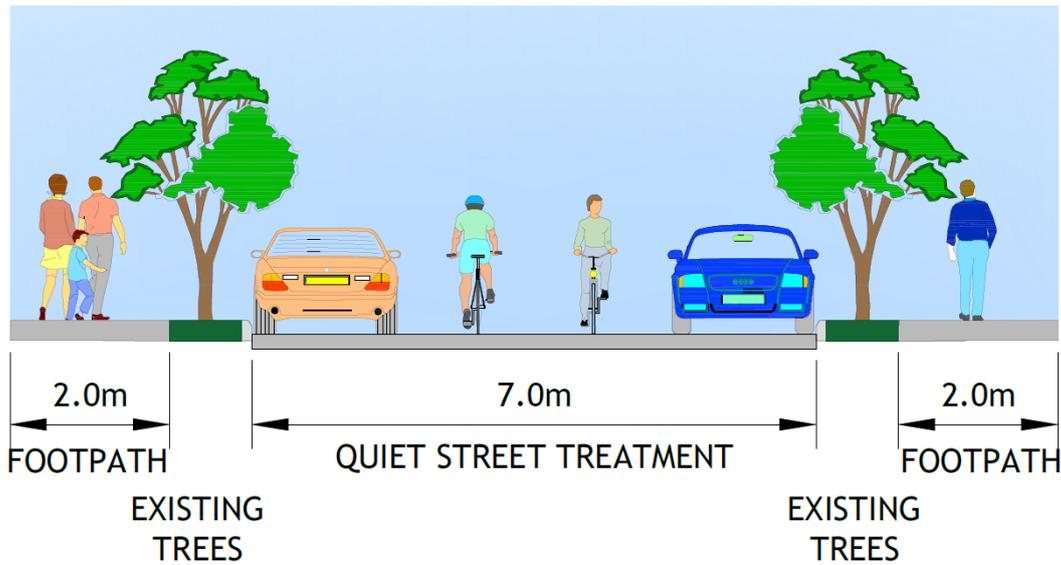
Cross-Section F-F (relevant to RG2 & RG4)
